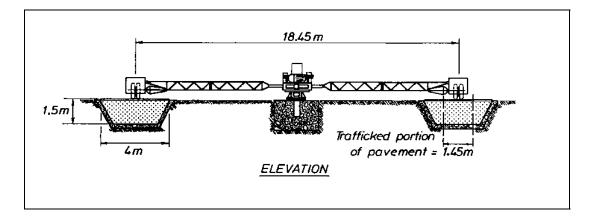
Elevation view of the CAPTIF testing equipment (Alabaster and Fussell, 2006)
